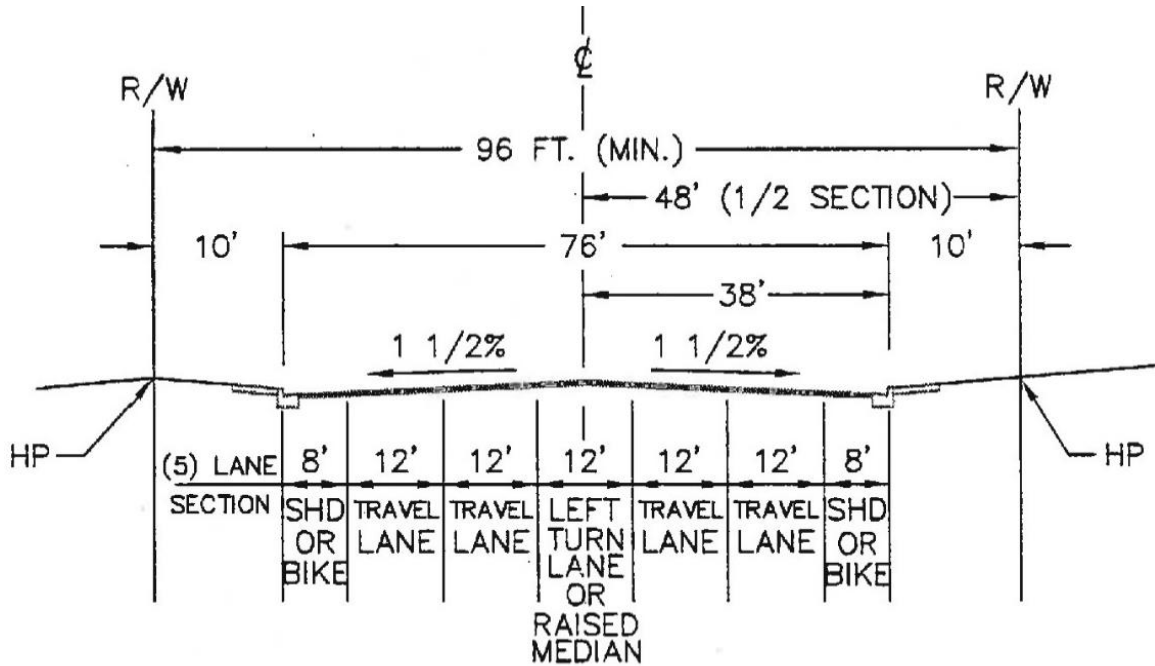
Arterial Street on 30-acre Property (Railroad Avenue)
